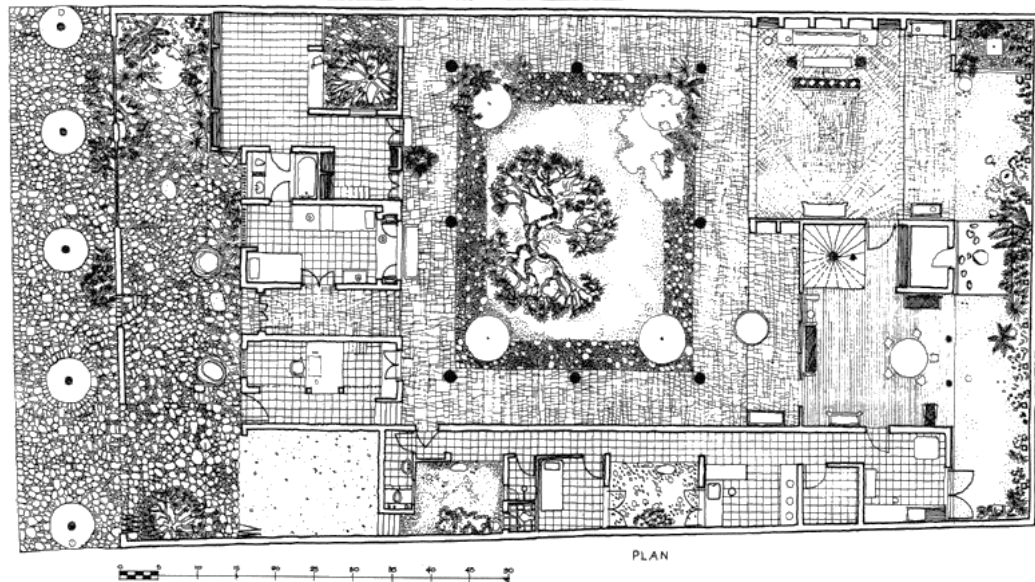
House for Osmund and Ena de Silva Floor Plan, Robson & Bawa, 2004
